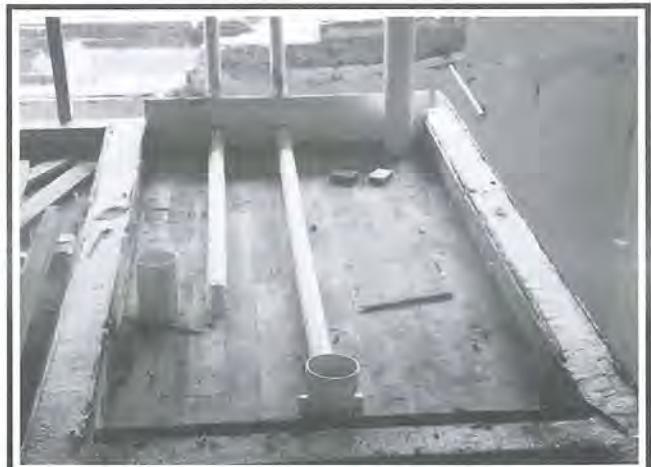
Pre-cast concrete ring beam at the perimeter of the toilet area to conceal the pipes which run on the existing timber floor. The toilet floor finish will be installed above the timber floor to prevent damaging it.
